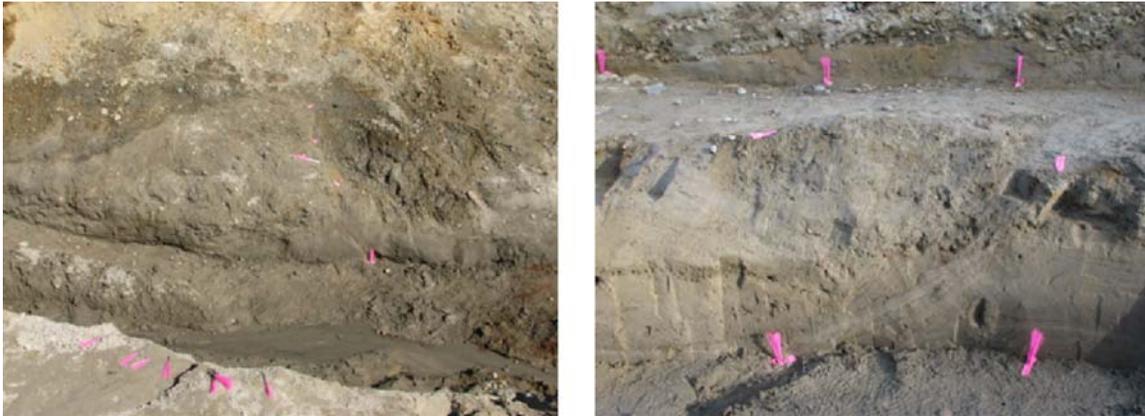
Curvi-planar feature at about Sta 0+28 in Trench South 1 and on the opposite side of the excavation in Trench South 1c.
